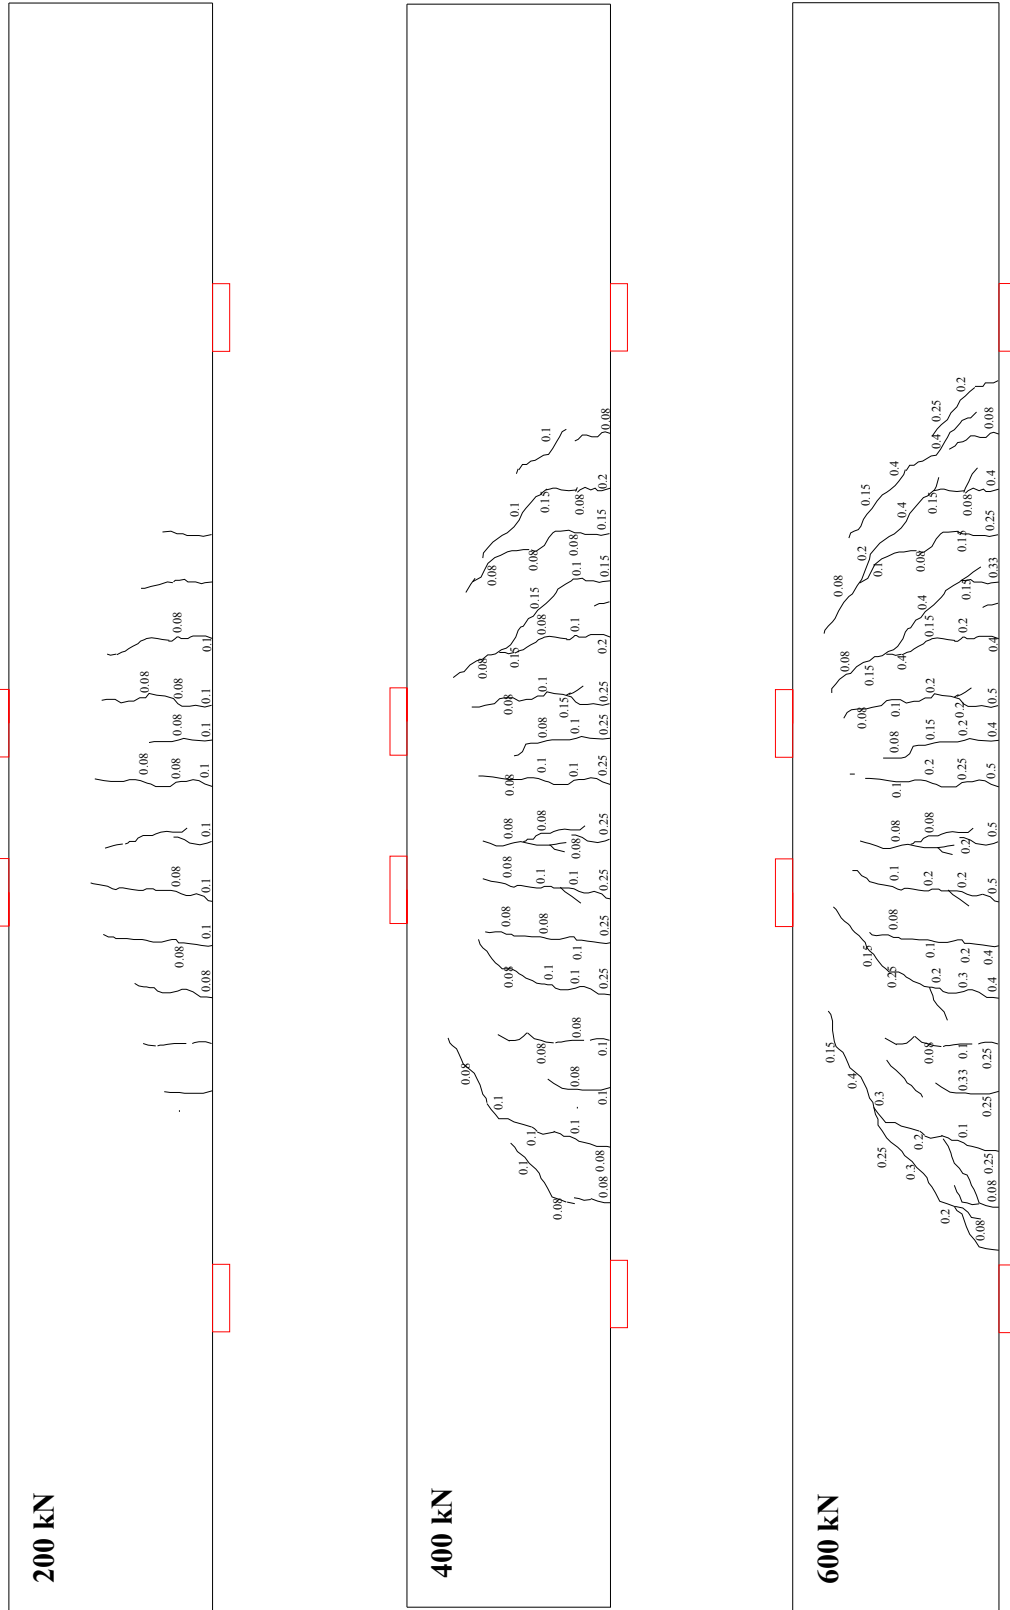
Crack patterns at 200 kN, 400 kN and 600 kN of loading at test of specimen MS3-2
